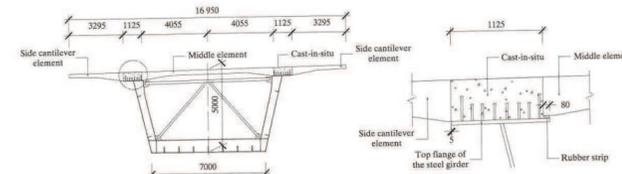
Typical cross section of the composite box girder (Units: mm)
